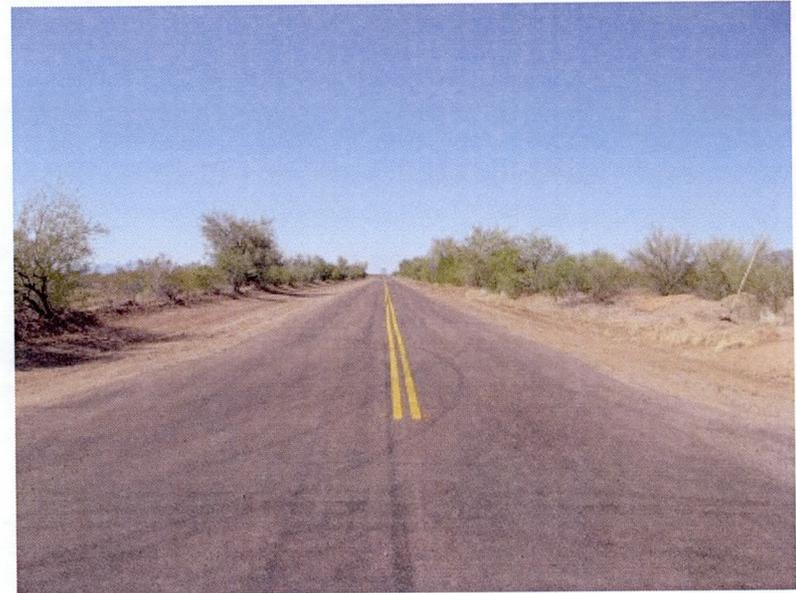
At the intersection of Citrus Road and Norwich Drive looking south at Citrus Road.
